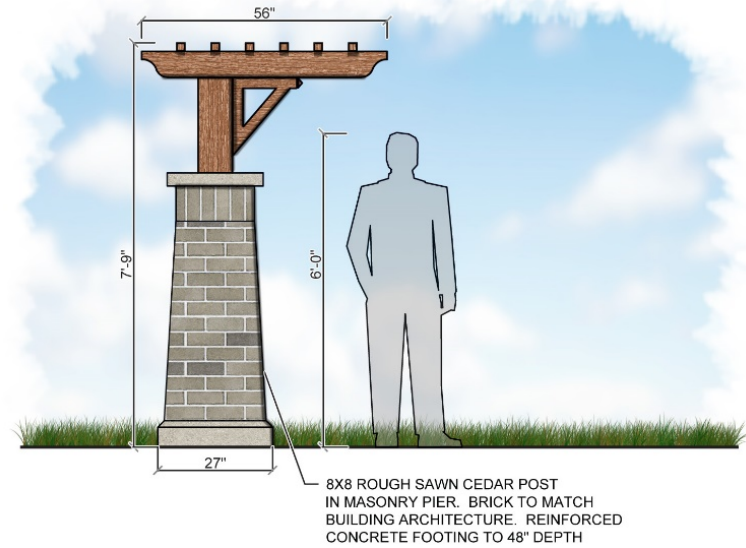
DETAIL - MOTOR COURT ENHANCEMENT FEATURE
